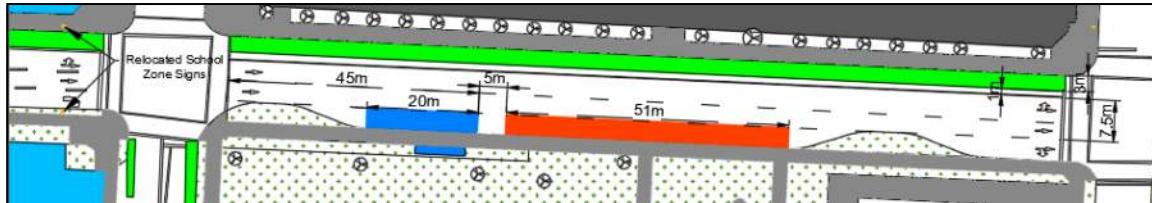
Permanent Parking Lane on 12<sup>th</sup> Avenue at Connaught School
